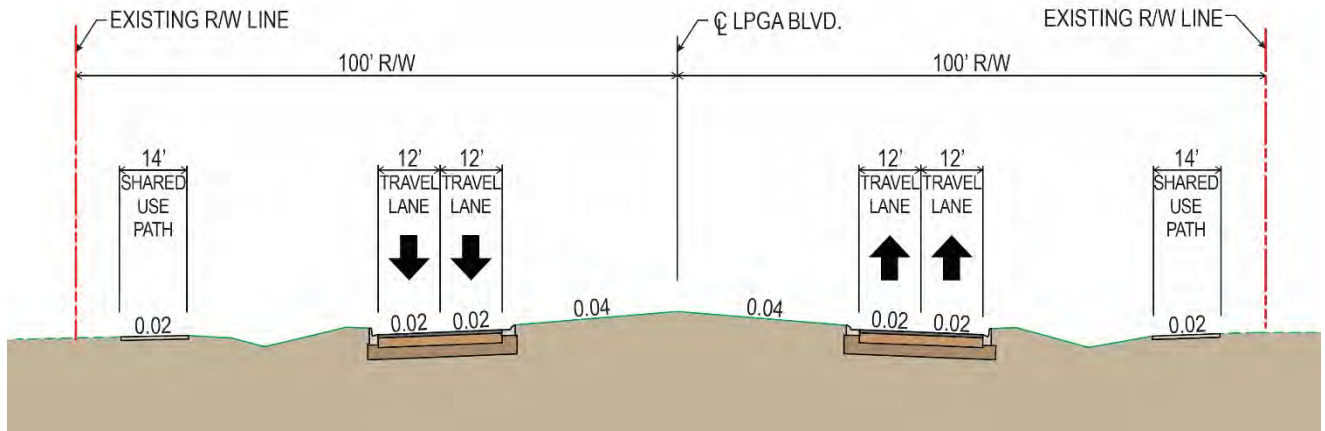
Proposed Typical Section from US 92 to Tymber Creek Road
